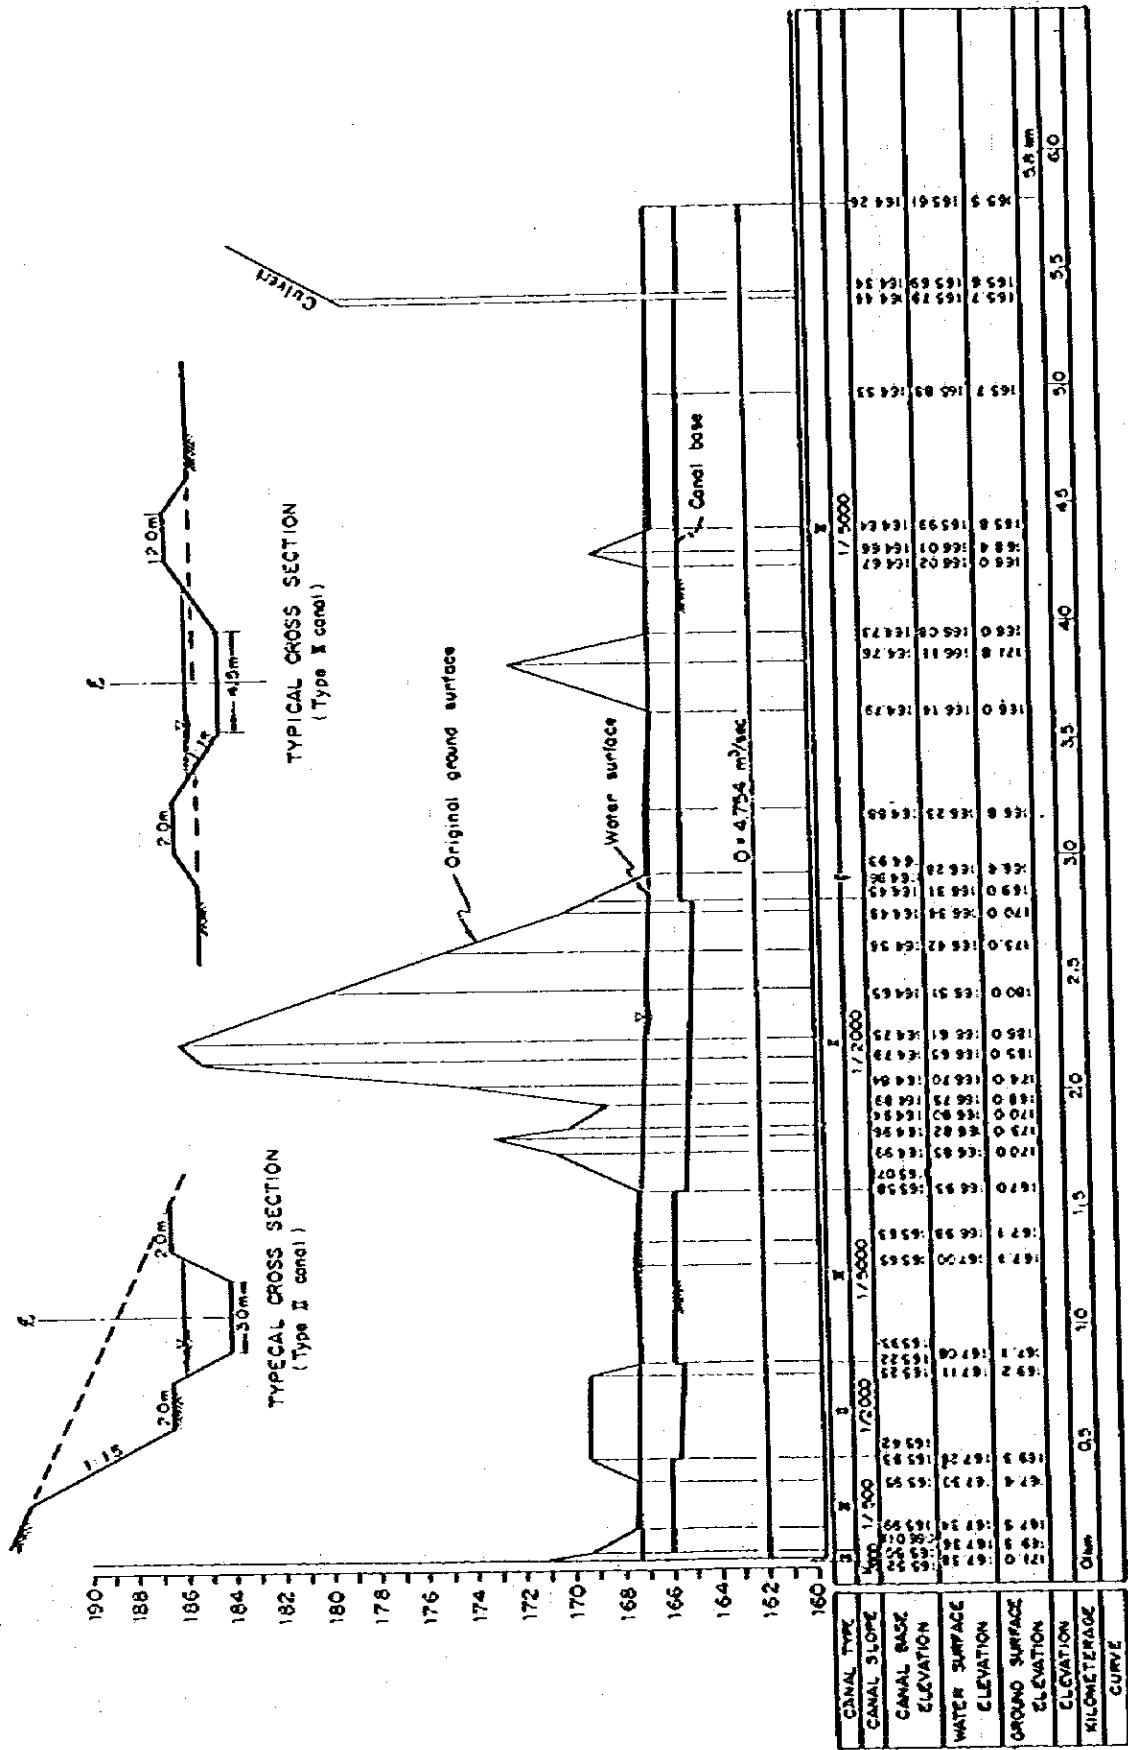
LONGITUDINAL SECTION FOR ALTERNATIVE II
